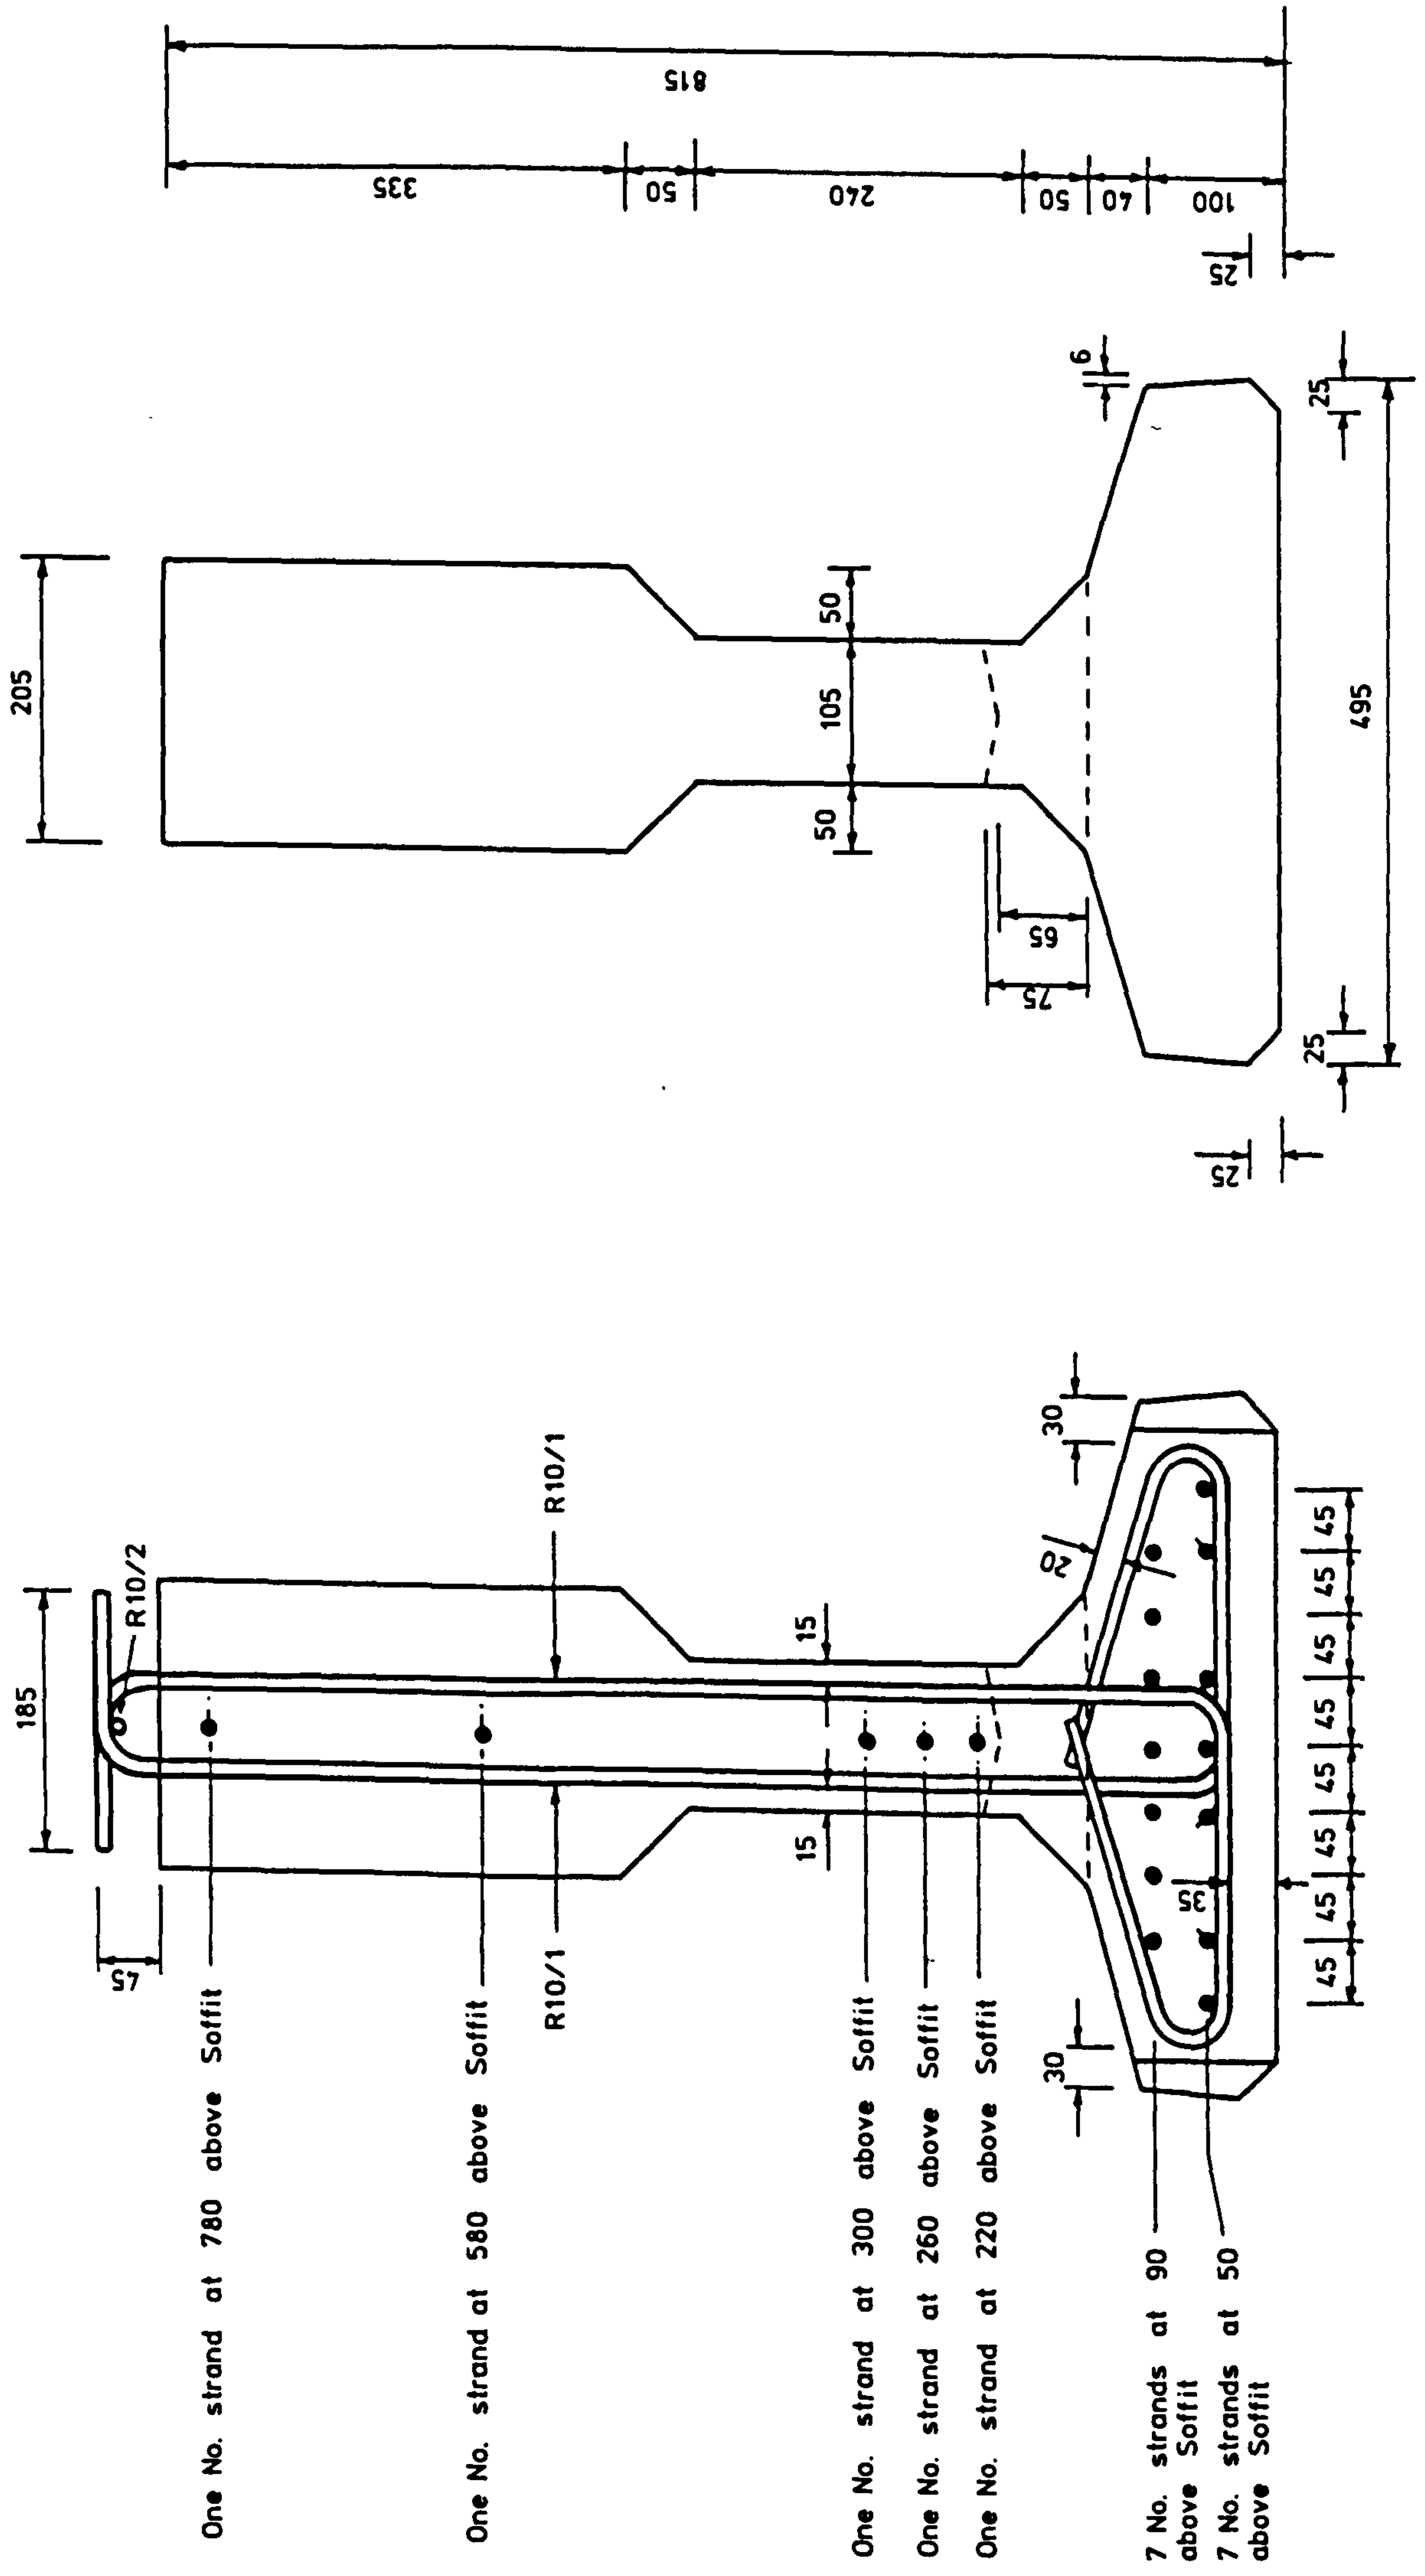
END ELEVATION OF FULL SIZE DECK 2 PRECAST BEAMS SHOWING GEOMETRICAL AND REINFORCEMENT LAYOUT
